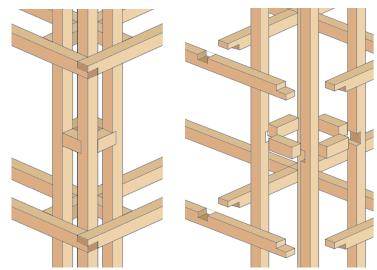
Column Lapping Diagram (a) Constructed (b) Exploded
